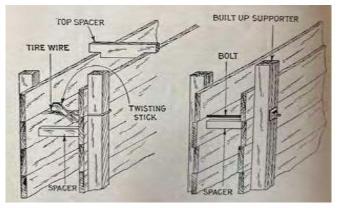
Twisted wire and bolt braces as used on concrete forms to insure maintaining the proper distance between the retaining boards. The tie wire braces are tightened by twisting. (Source: Concrete Construction, International Textbook Company Ics)
